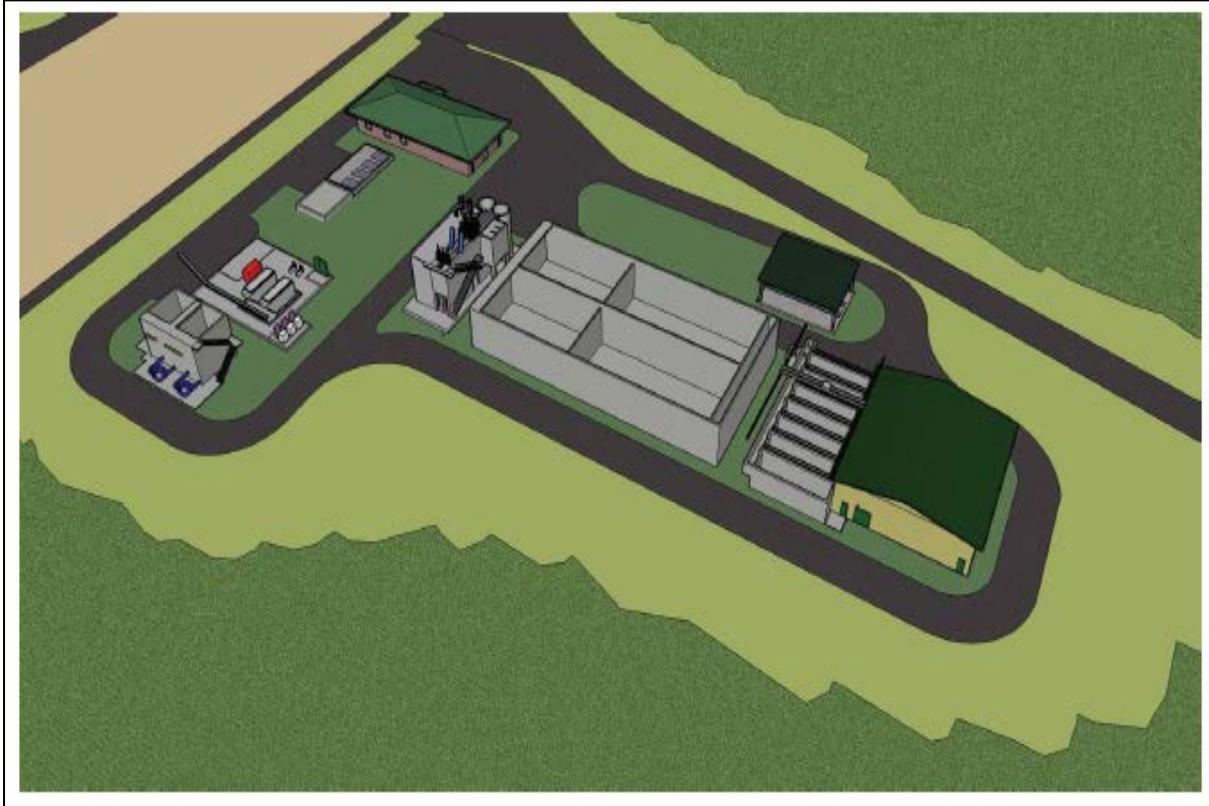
Existing and Future Solo Point WWTP Facilities
